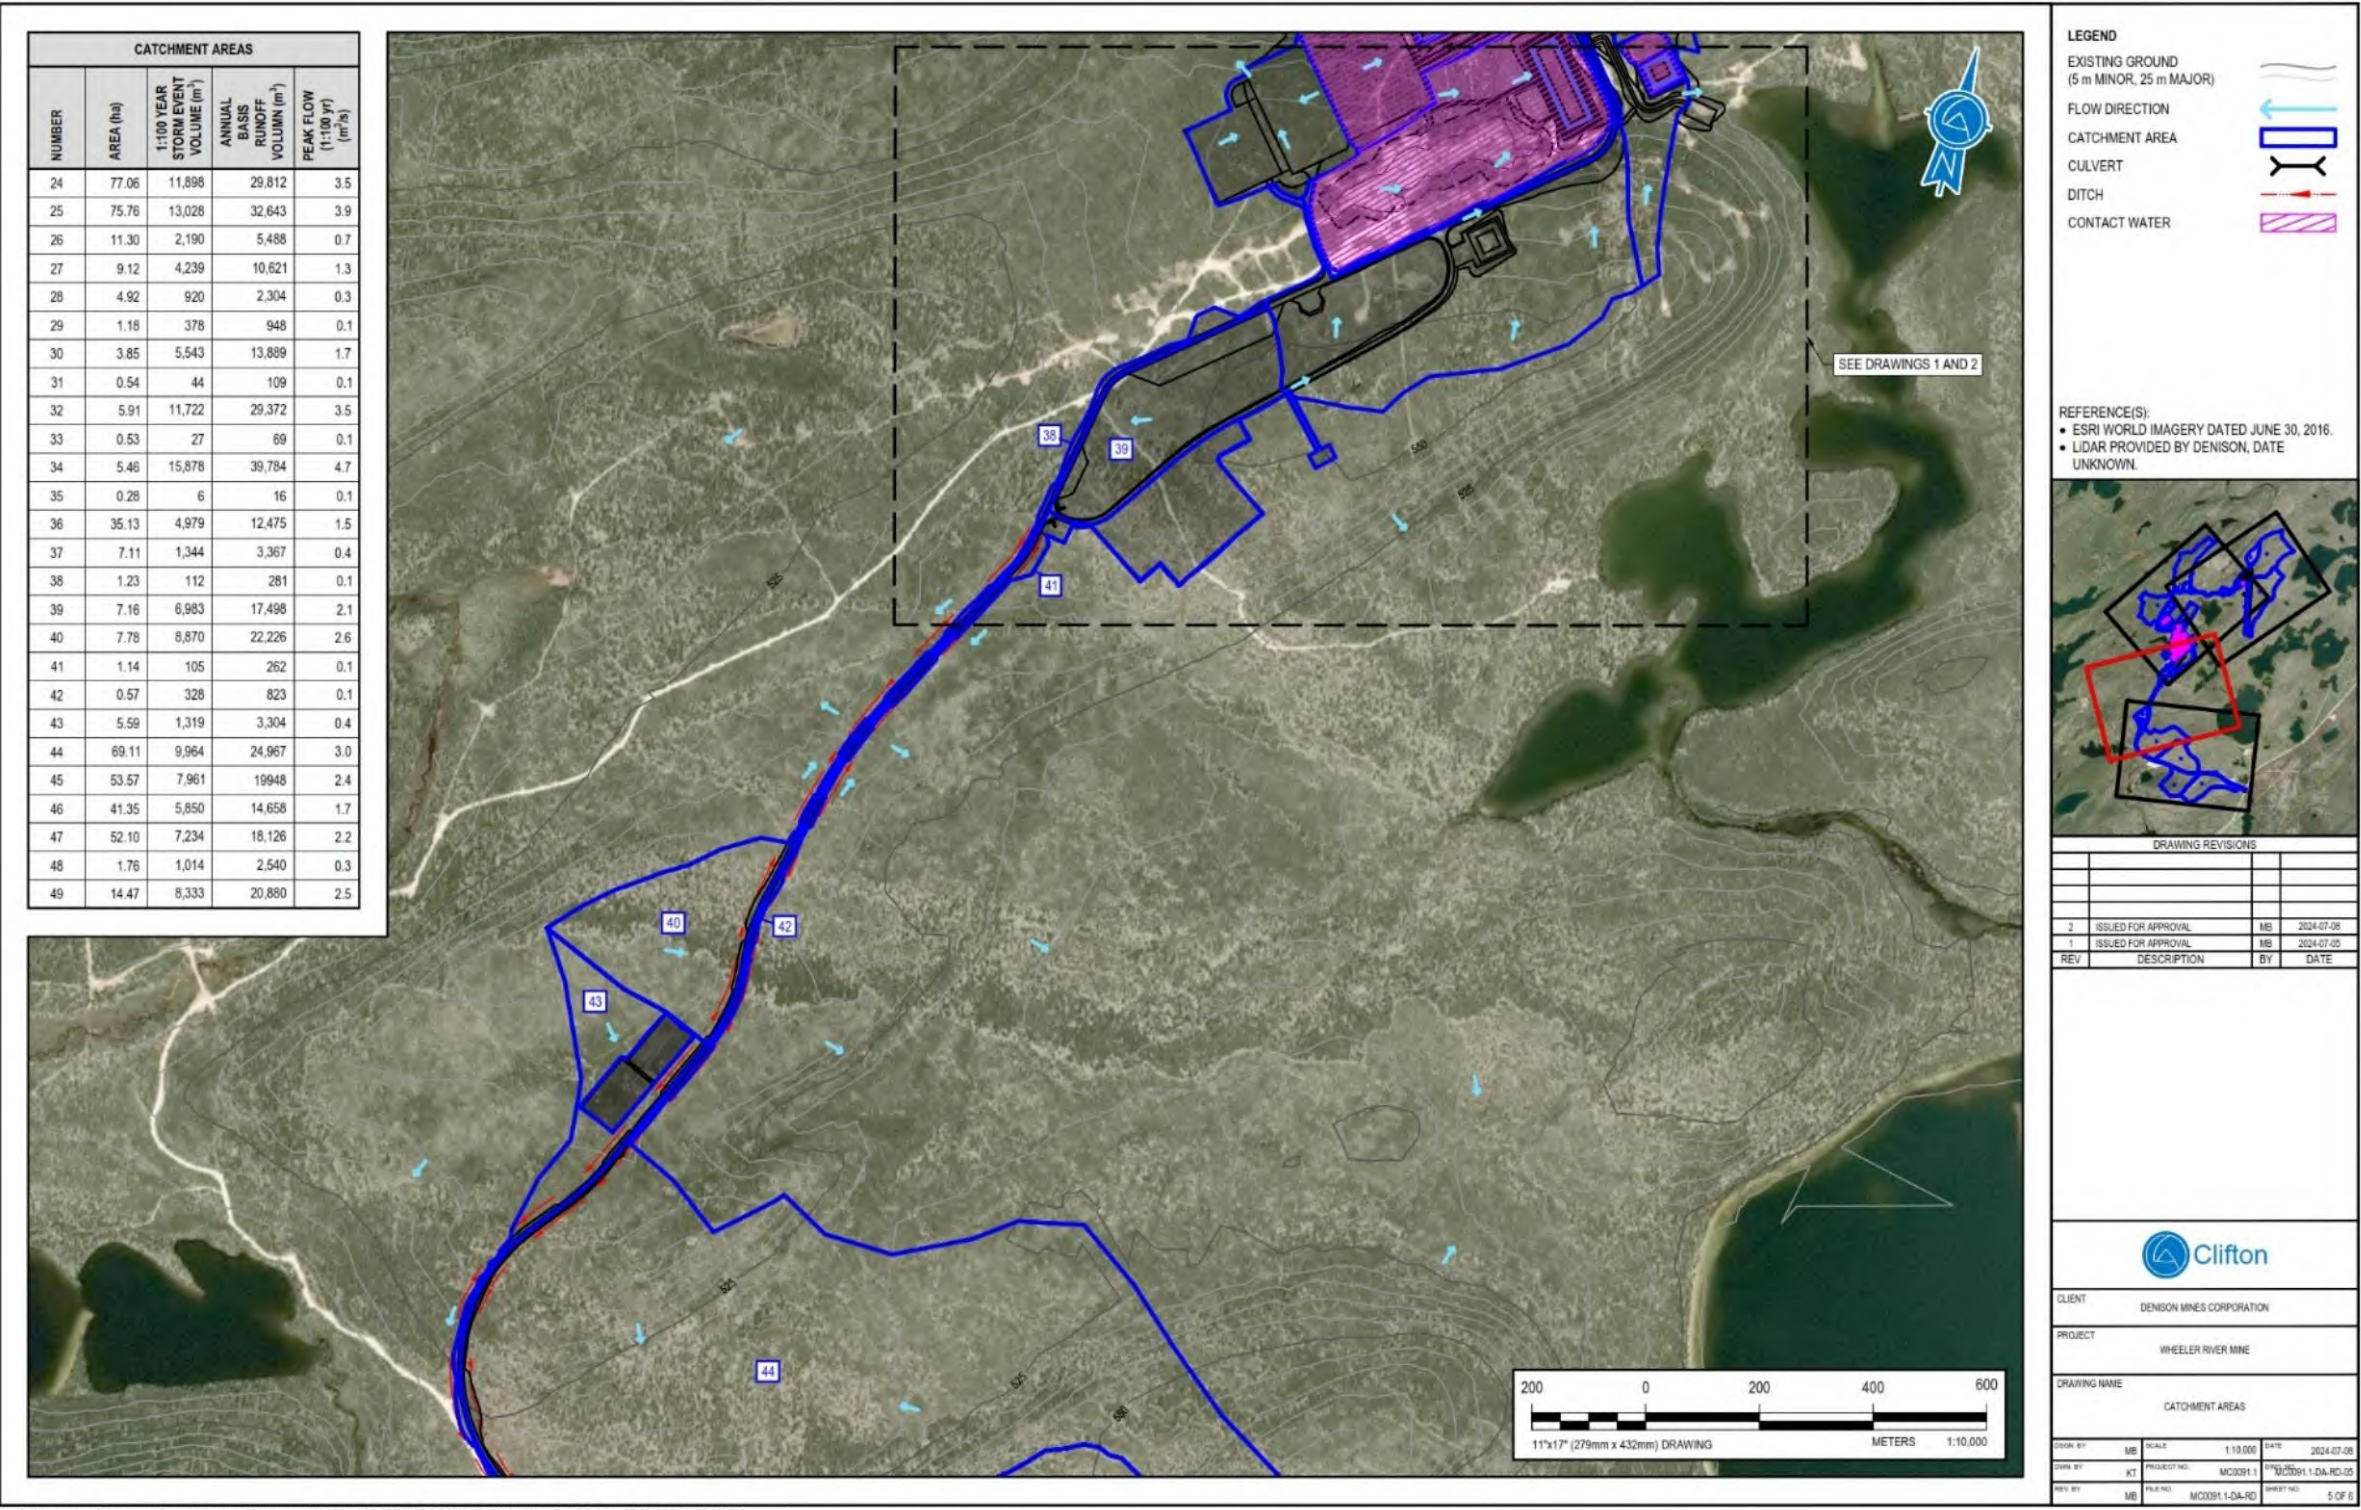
Site water management catchment areas – layout 4 of 5: Access road south of main Project area
